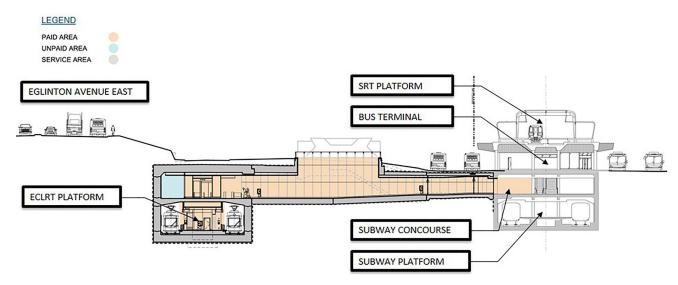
Eglinton Crosstown LRT and TTC Kennedy Transit Station Kennedy Cross-section looking east (TTC, 2018a)
